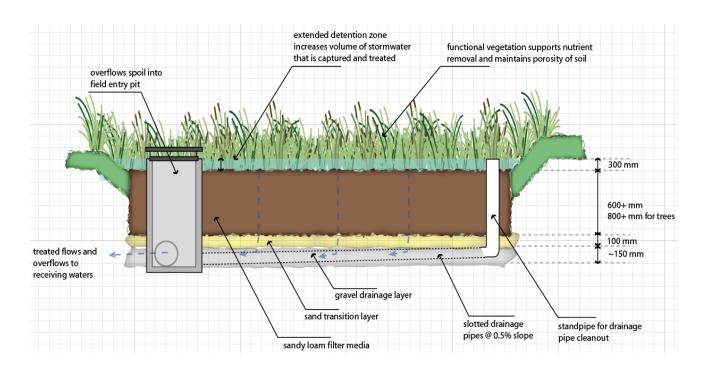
Bioretention system typical arrangement (Water by Design 2009)
